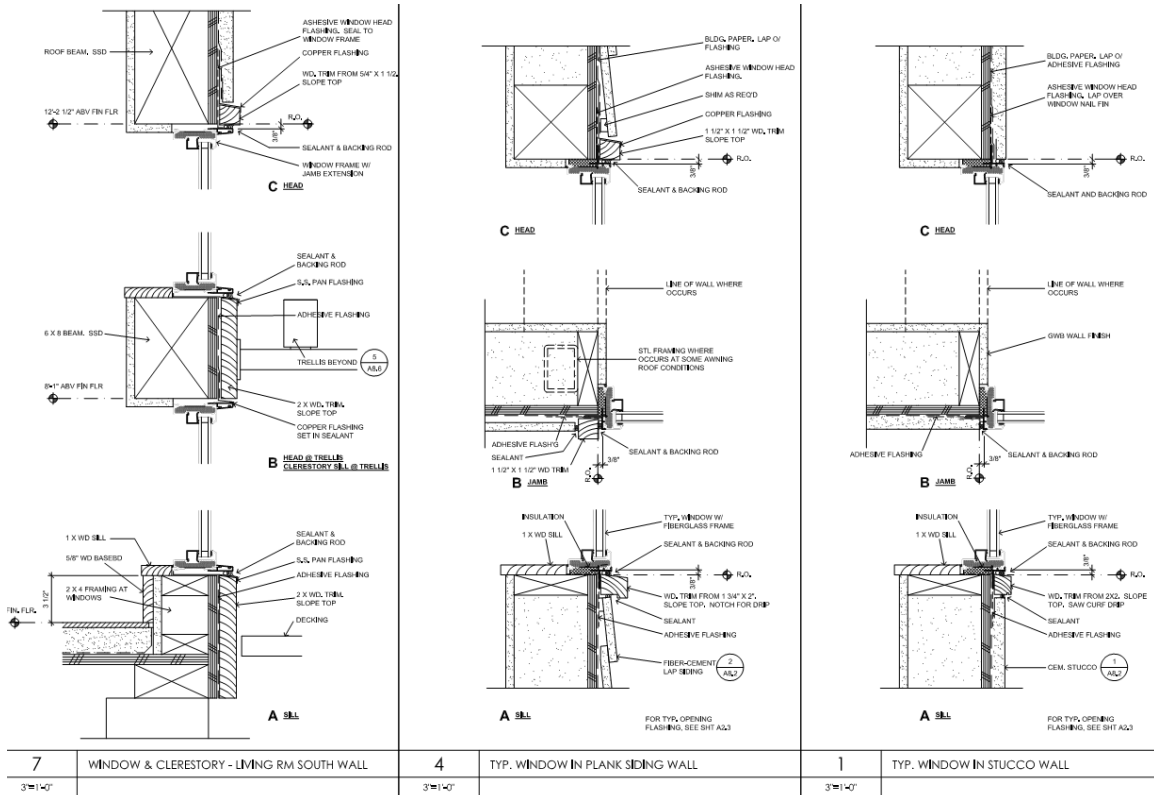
Window installation details for clerestory windows (left), windows in plank siding wall (middle), and windows in stucco wall (right)
